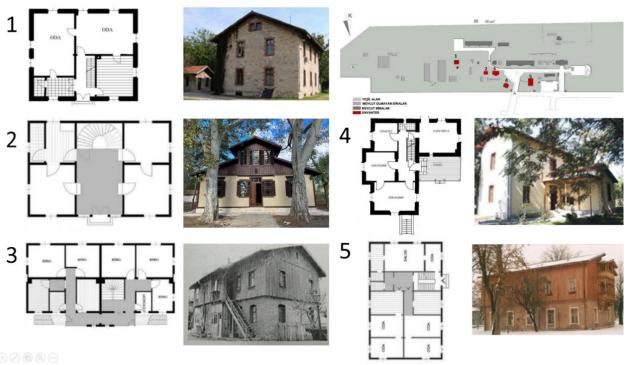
Lodging buildings (Edited accordingly T.U. Department of Construction Affairs Archives)
